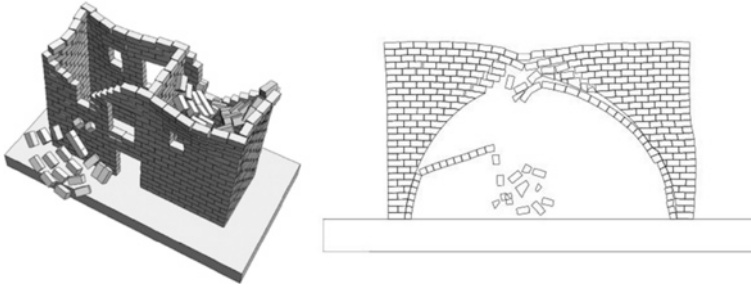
Modelling of an unreinforced masonry structure (*left*) and a vaulted wall (*right*) within a discrete element approach [49]
